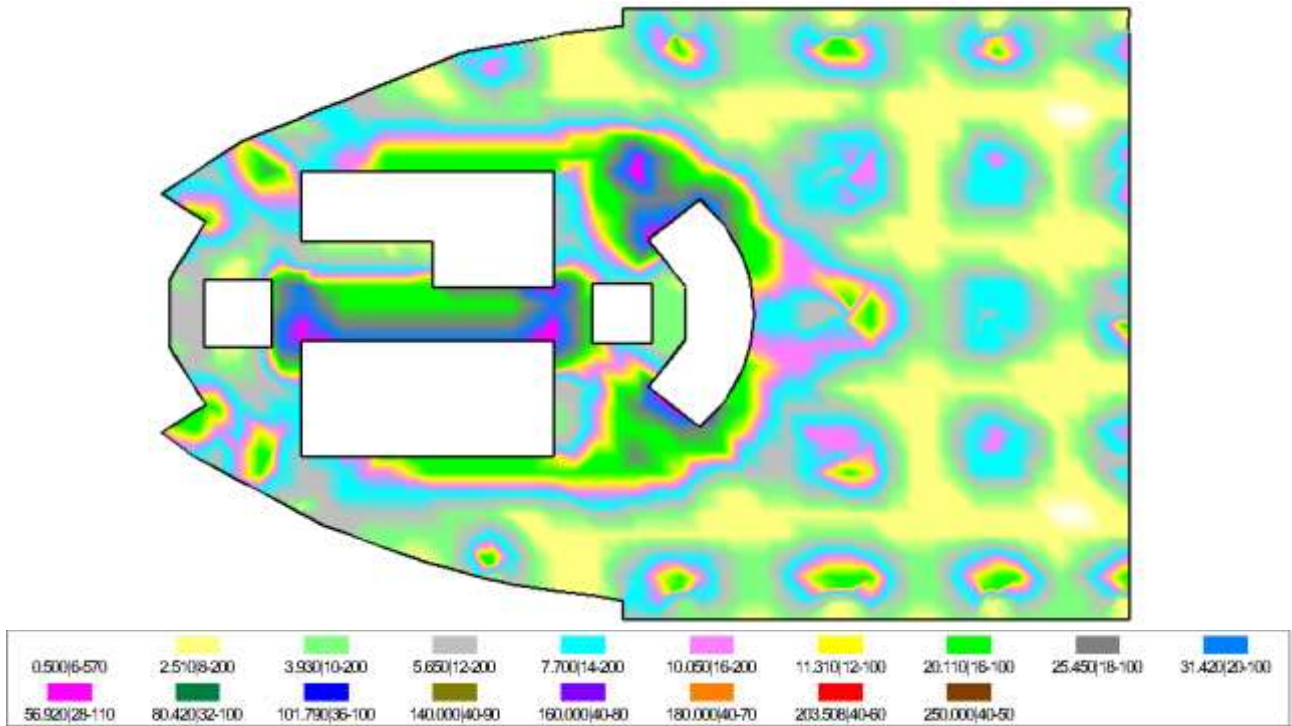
Reinforcement of the floor slab of the eastern tower at +42.80 m. Upper longitudinal reinforcement in the direction of the axis *S*, cm<sup>2</sup>/m [15]
